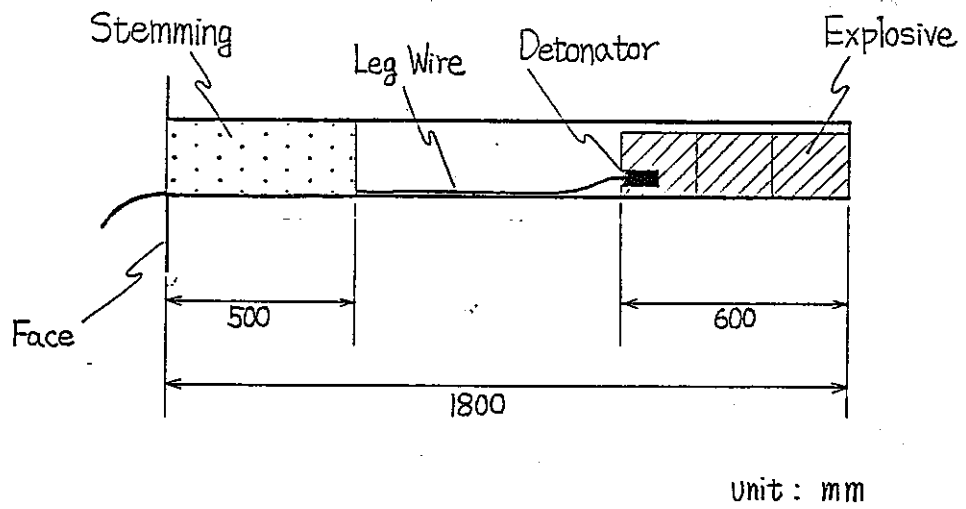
Method of Filling Explosives in a Hole for Smooth Blasting.
